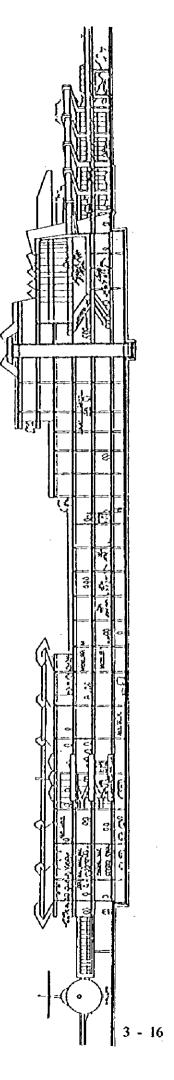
Cross Section of New Passenger Terminal Building T1
